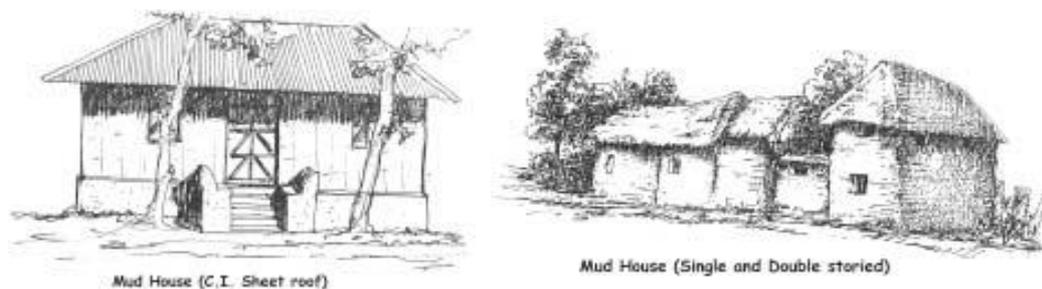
Mud-walled houses with CI sheet and thatched roof. (Source: Hasan, D.M., 1985)
